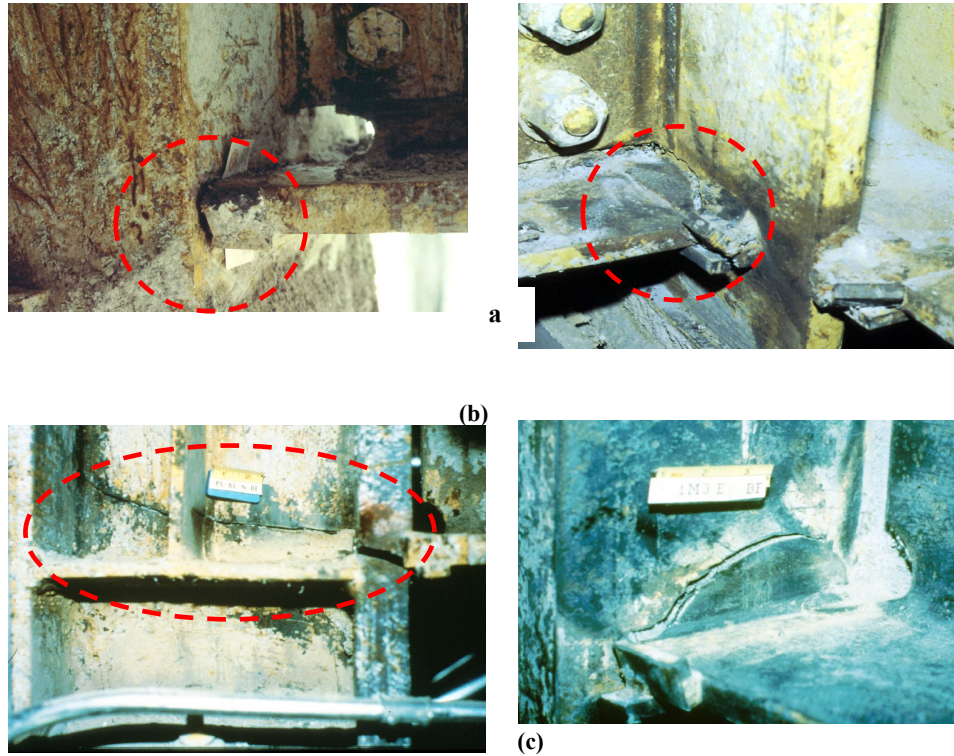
Typical damage observed after the Northridge earthquake, (a) Fracture at fuse zone, (b) column fracture, and (c) column flange “divot” fracture [10]
